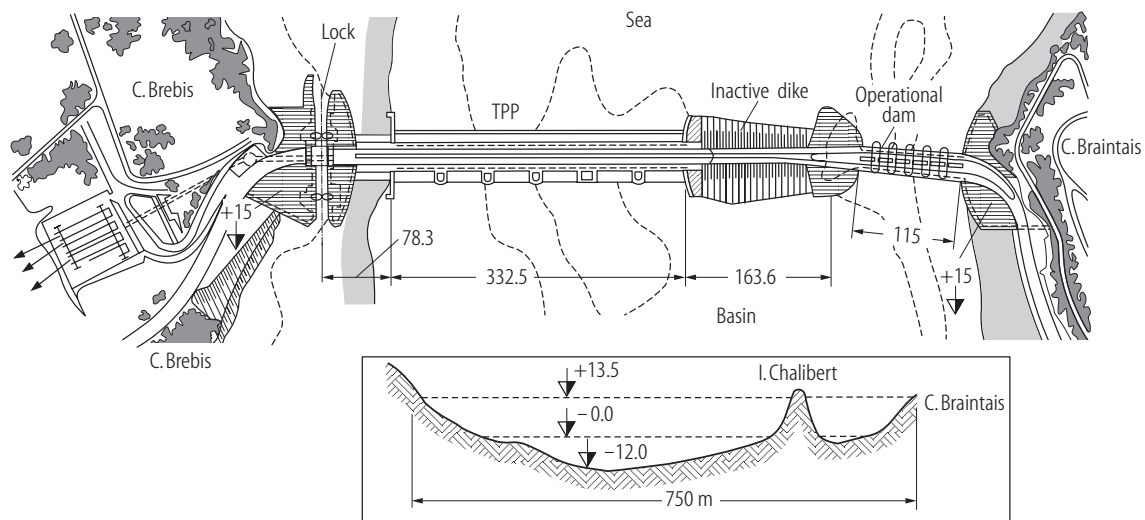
Plan view of the La Rance tidal power plant with profile along the centre line of the barrage prior to its construction [97Ber, p. 231].
